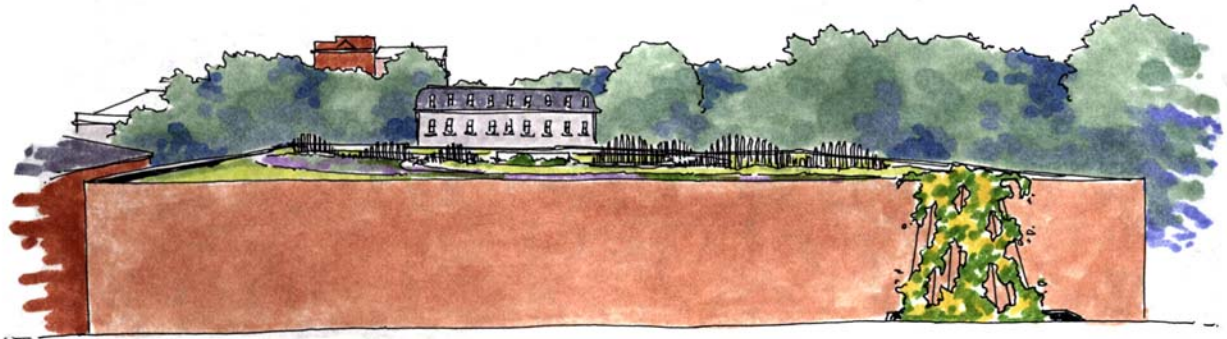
Extensive green roof design, 4th floor perspective view (from Caldwell Hall).
